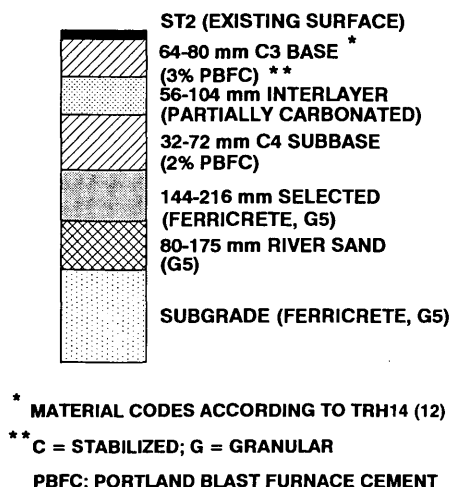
Existing pavement structure before crack-and-seat operation.
